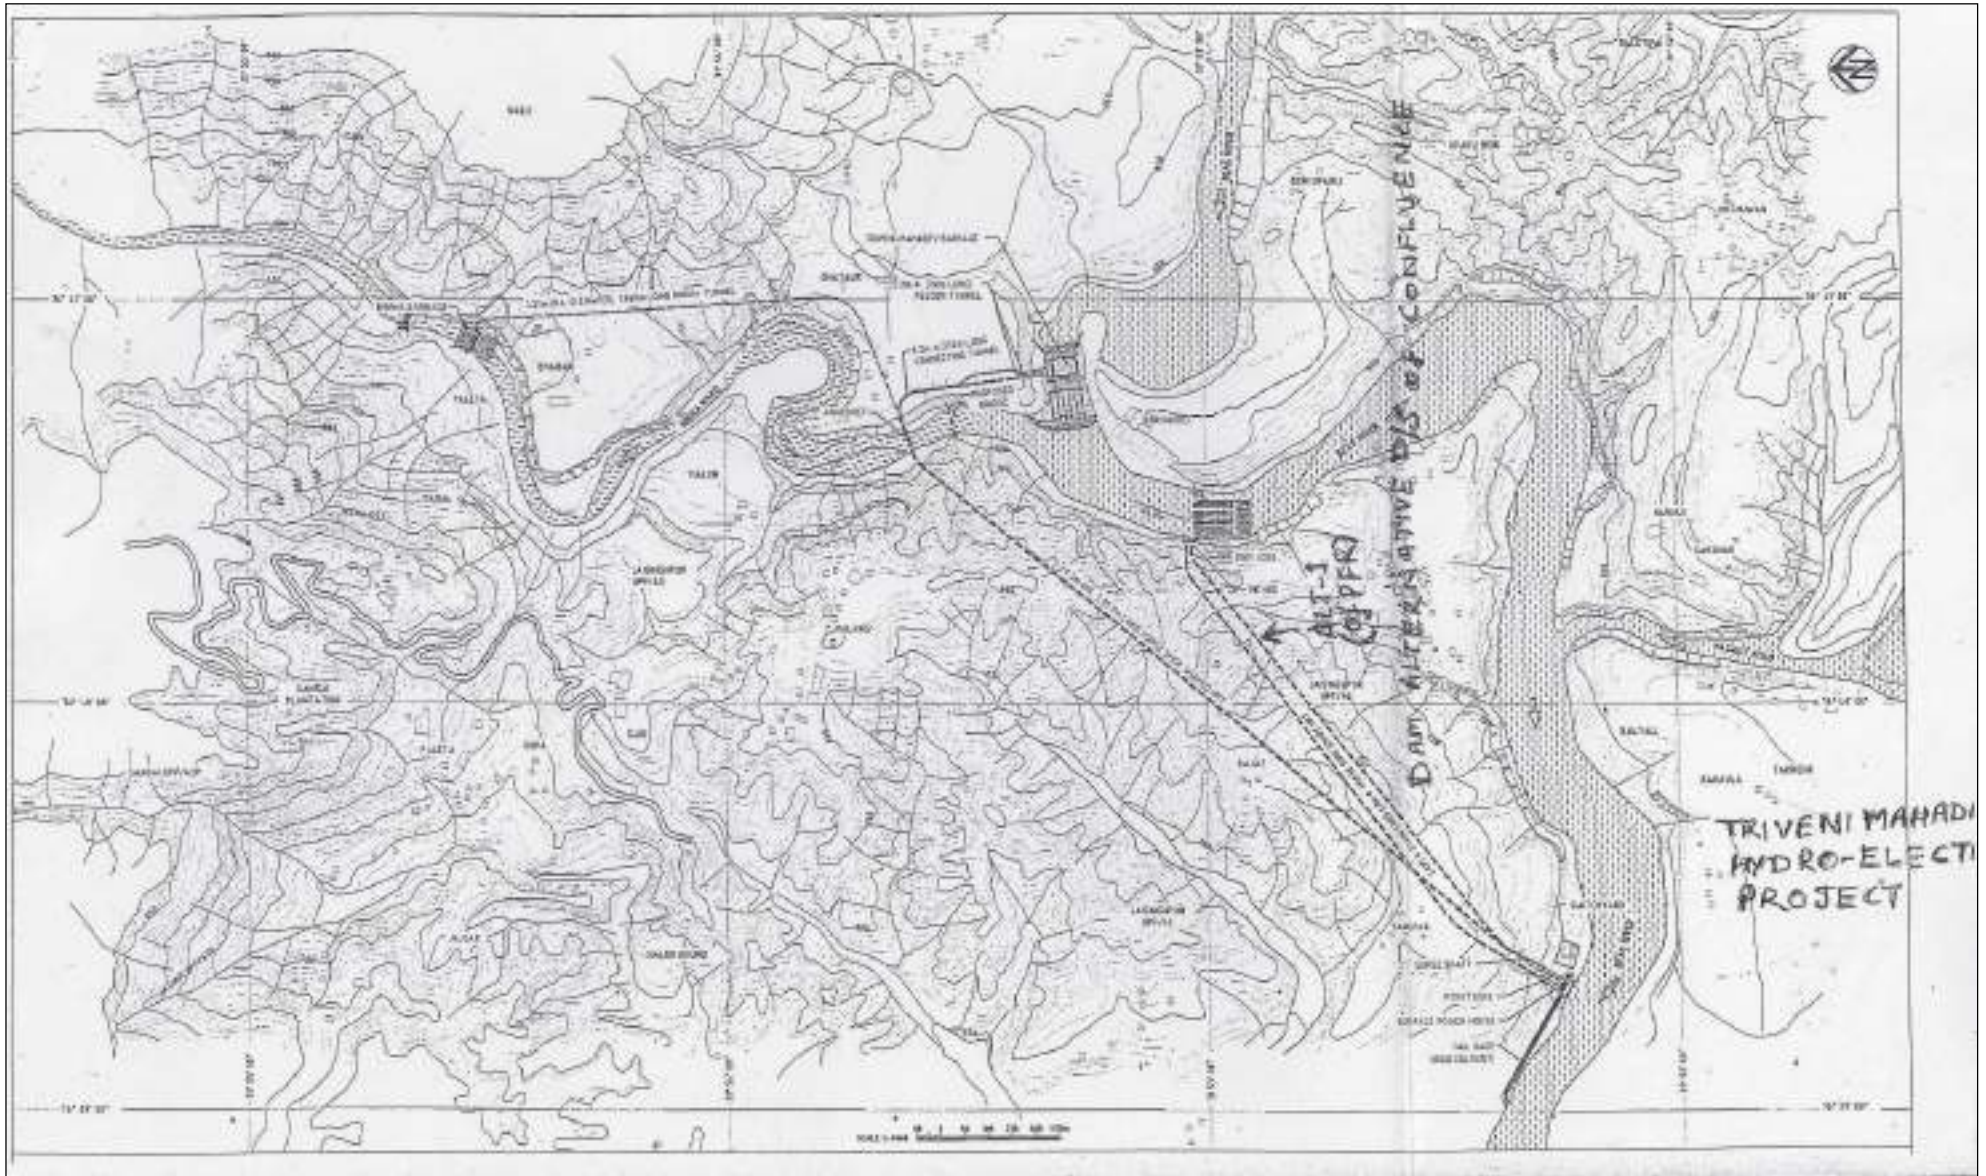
General Layout plan of Triveni Mahadev HEP
